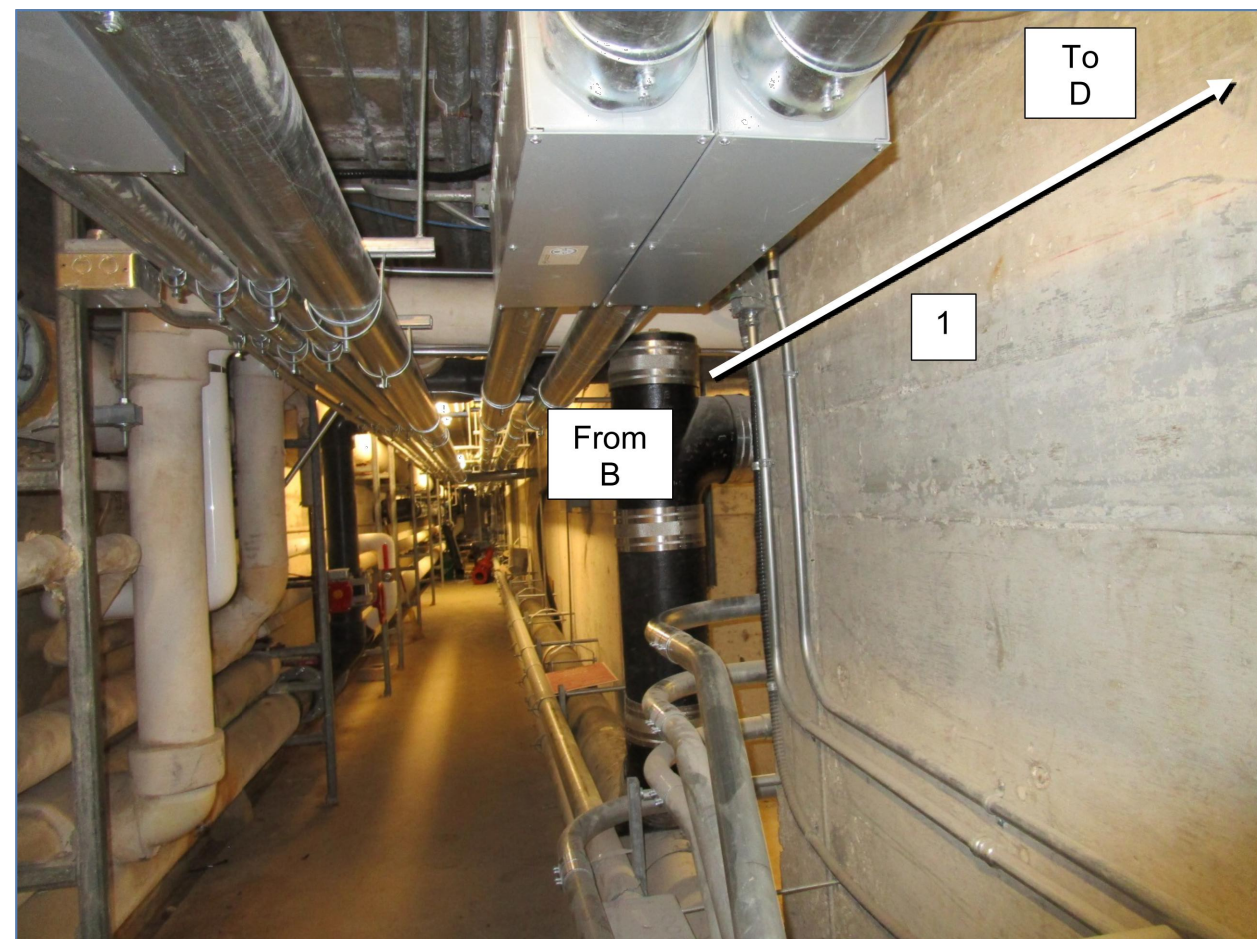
Location C, attachment to wall after crossing tunnel intersection
